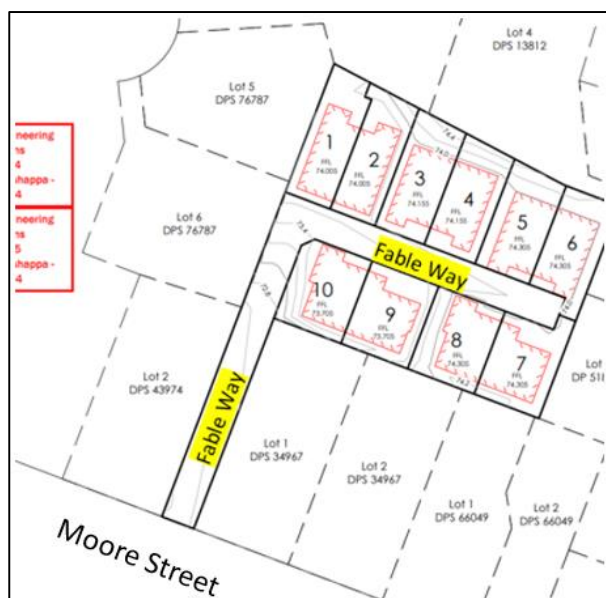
Fable Way shown for the five duplex development on an L shaped private road at 71 and 69 Moore Street
